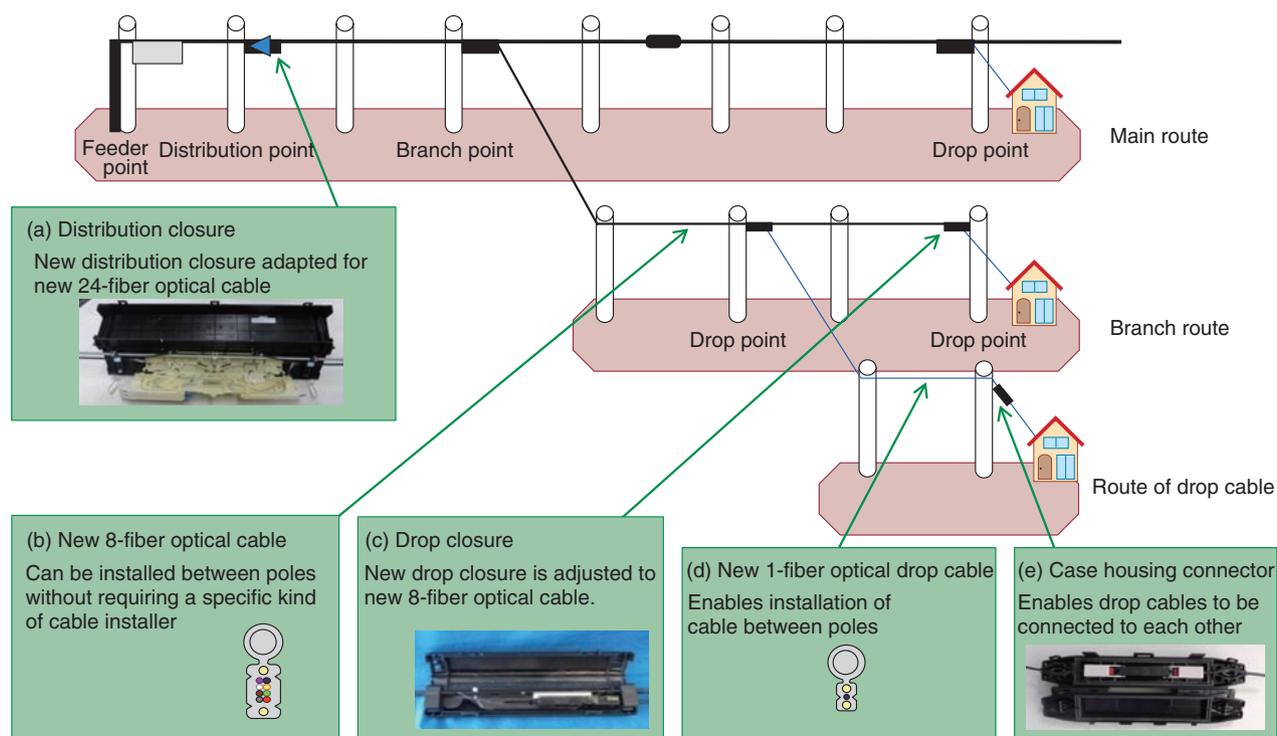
Model showing the developed equipment (branch route and route of drop cable).
